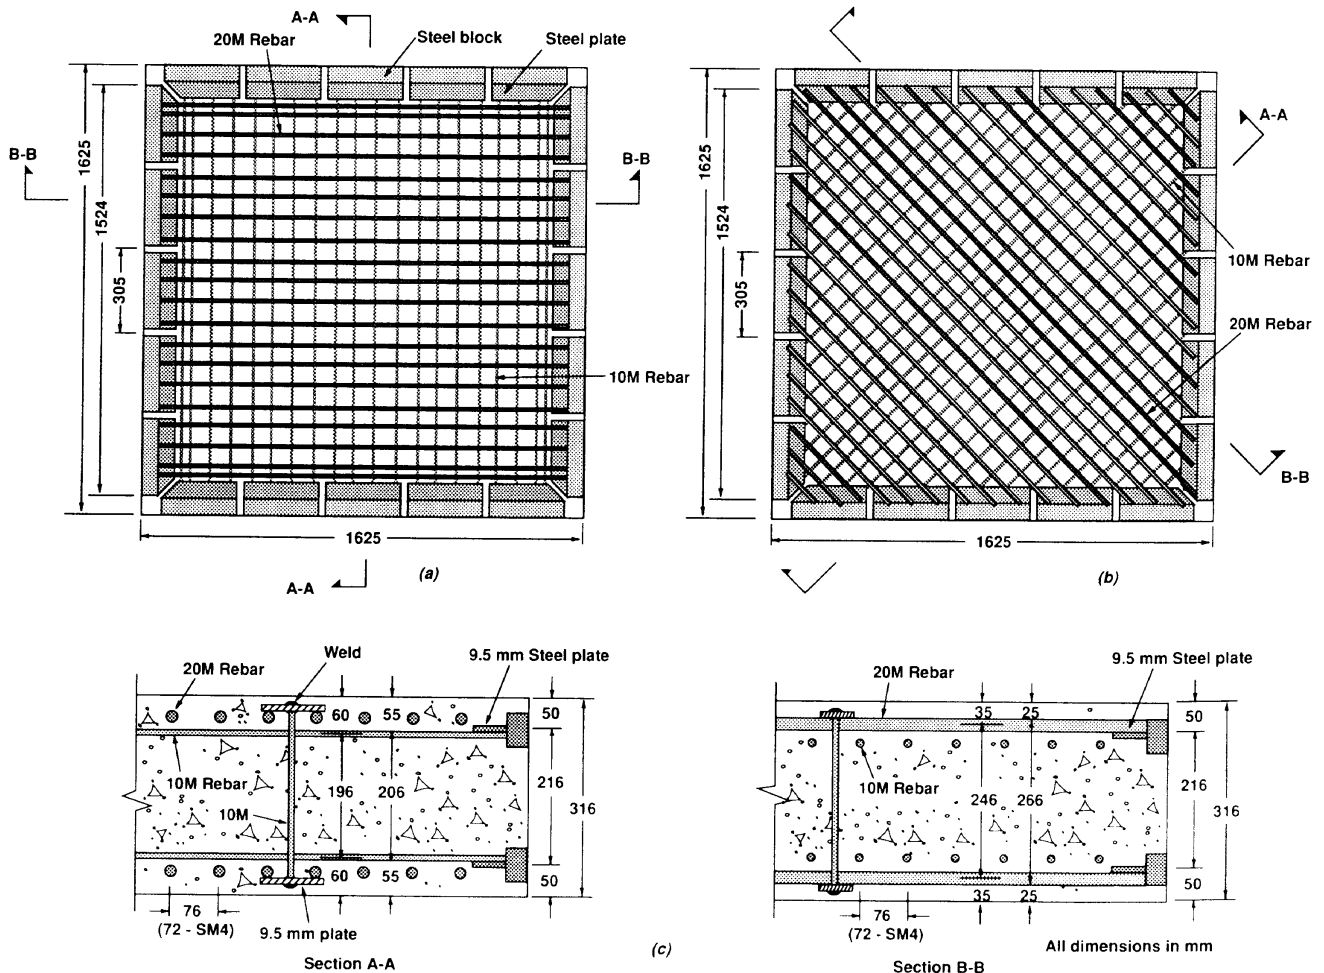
Specimen details: (a) Specimens SM1 through SM3; (b) Specimen SM4; (c) cross-sectional details (1 mm = 0.0394 in.)
